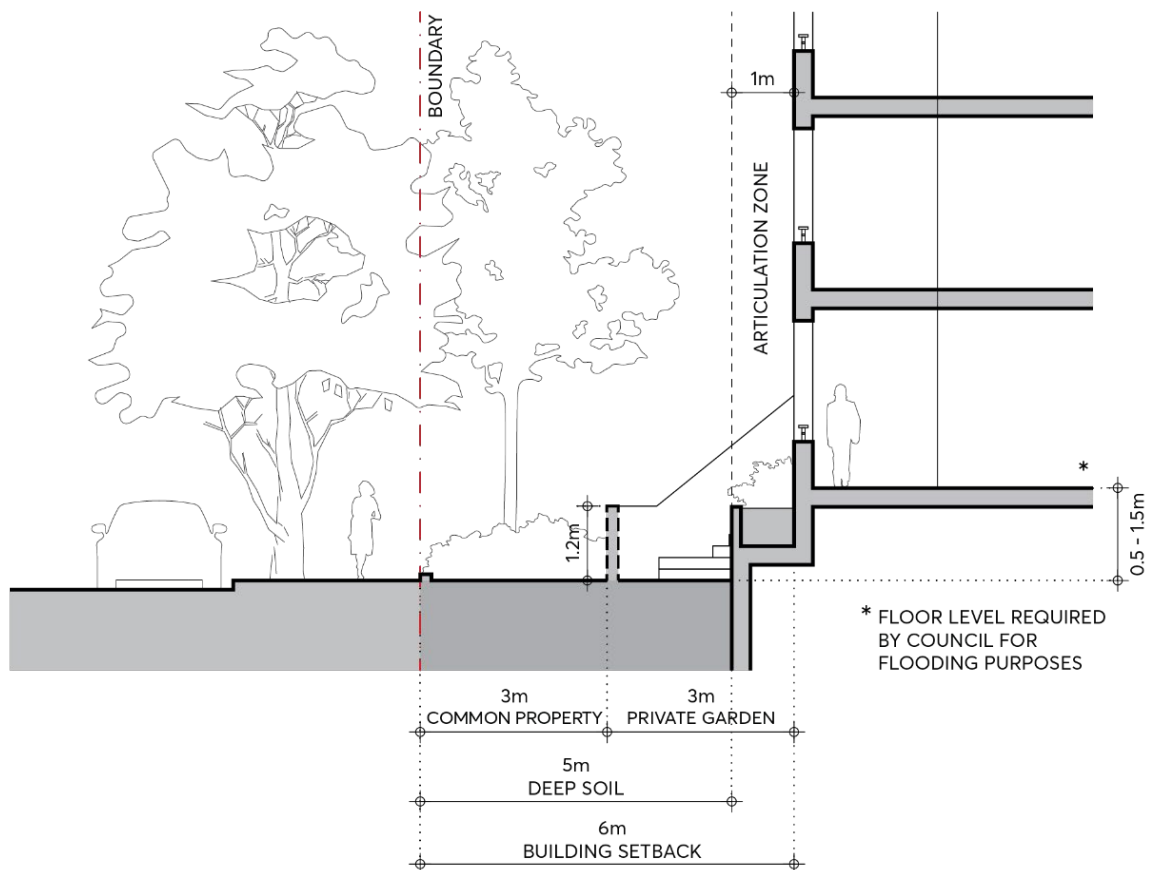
Residential Ground Floor: Floor level required 0.5-1.5m above footpath level
